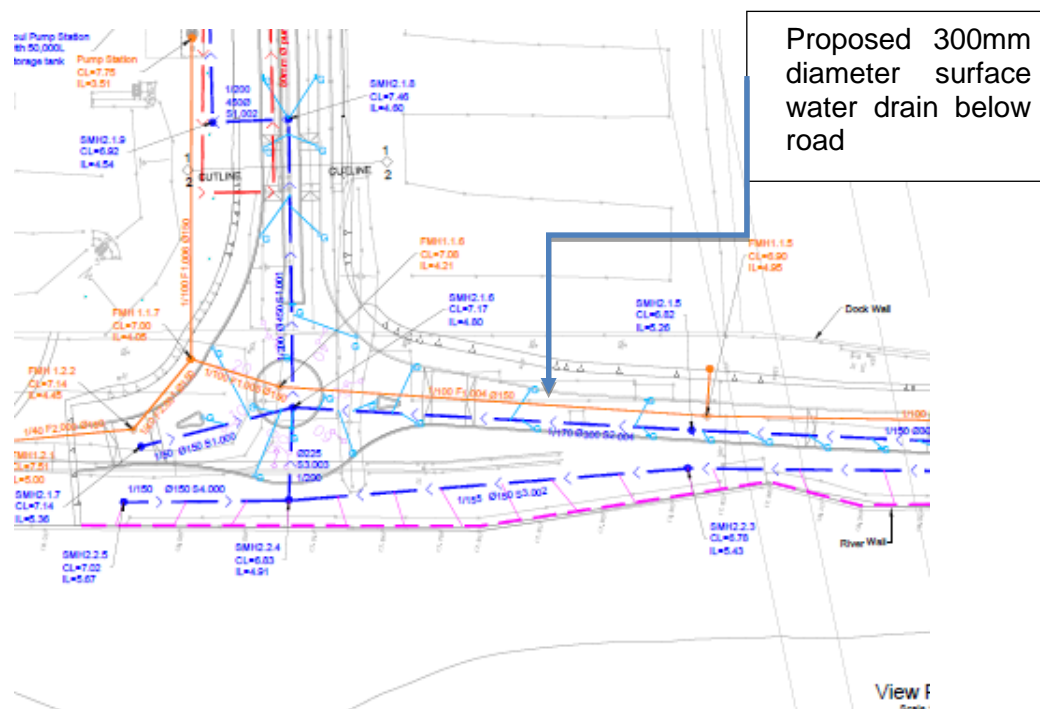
Road Drainage Extract One (Amey Consulting Drawing CO00205341-H-D-NLR-500)
